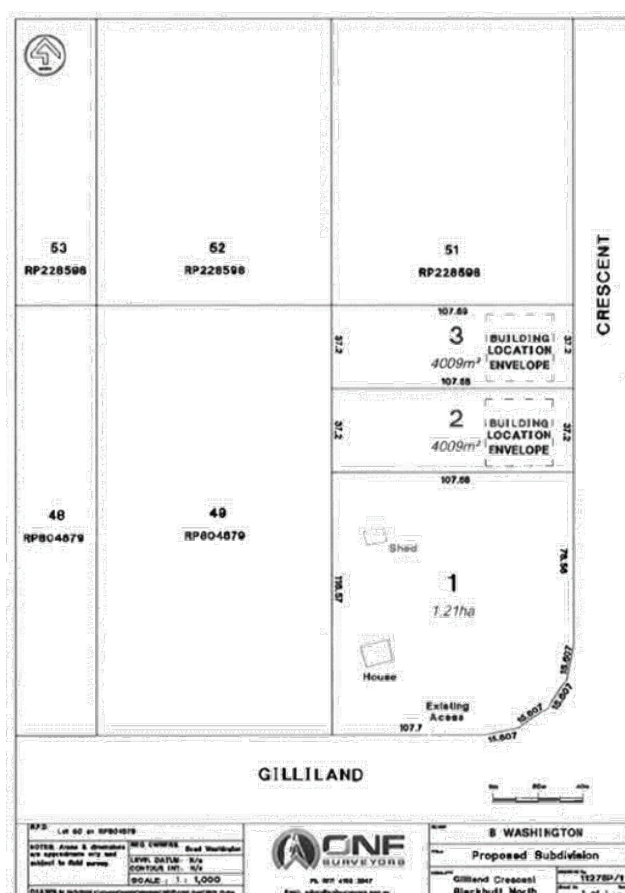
Proposed Subdivision Plan (ONF Surveyors).
